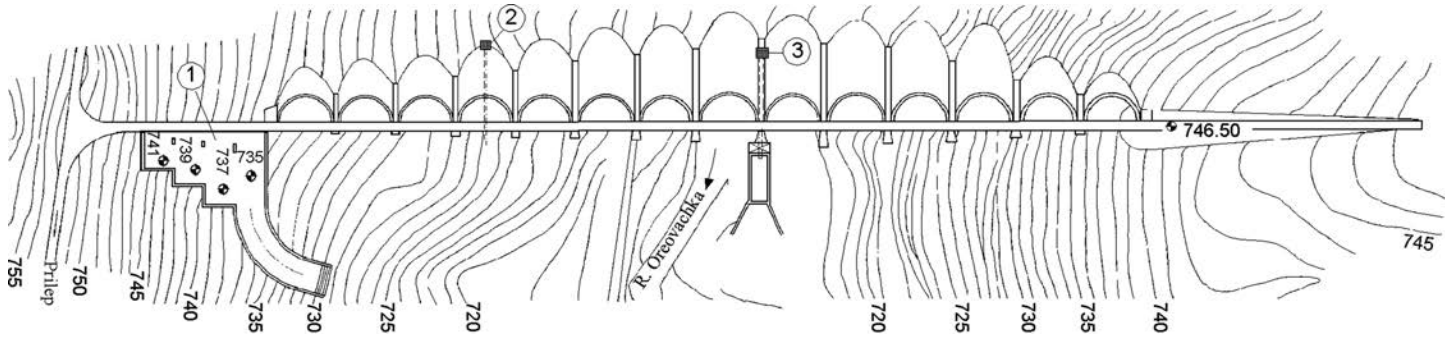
Prilep Dam, layout. (1) Overflow; (2) Intake; (3) Bottom outlet .
